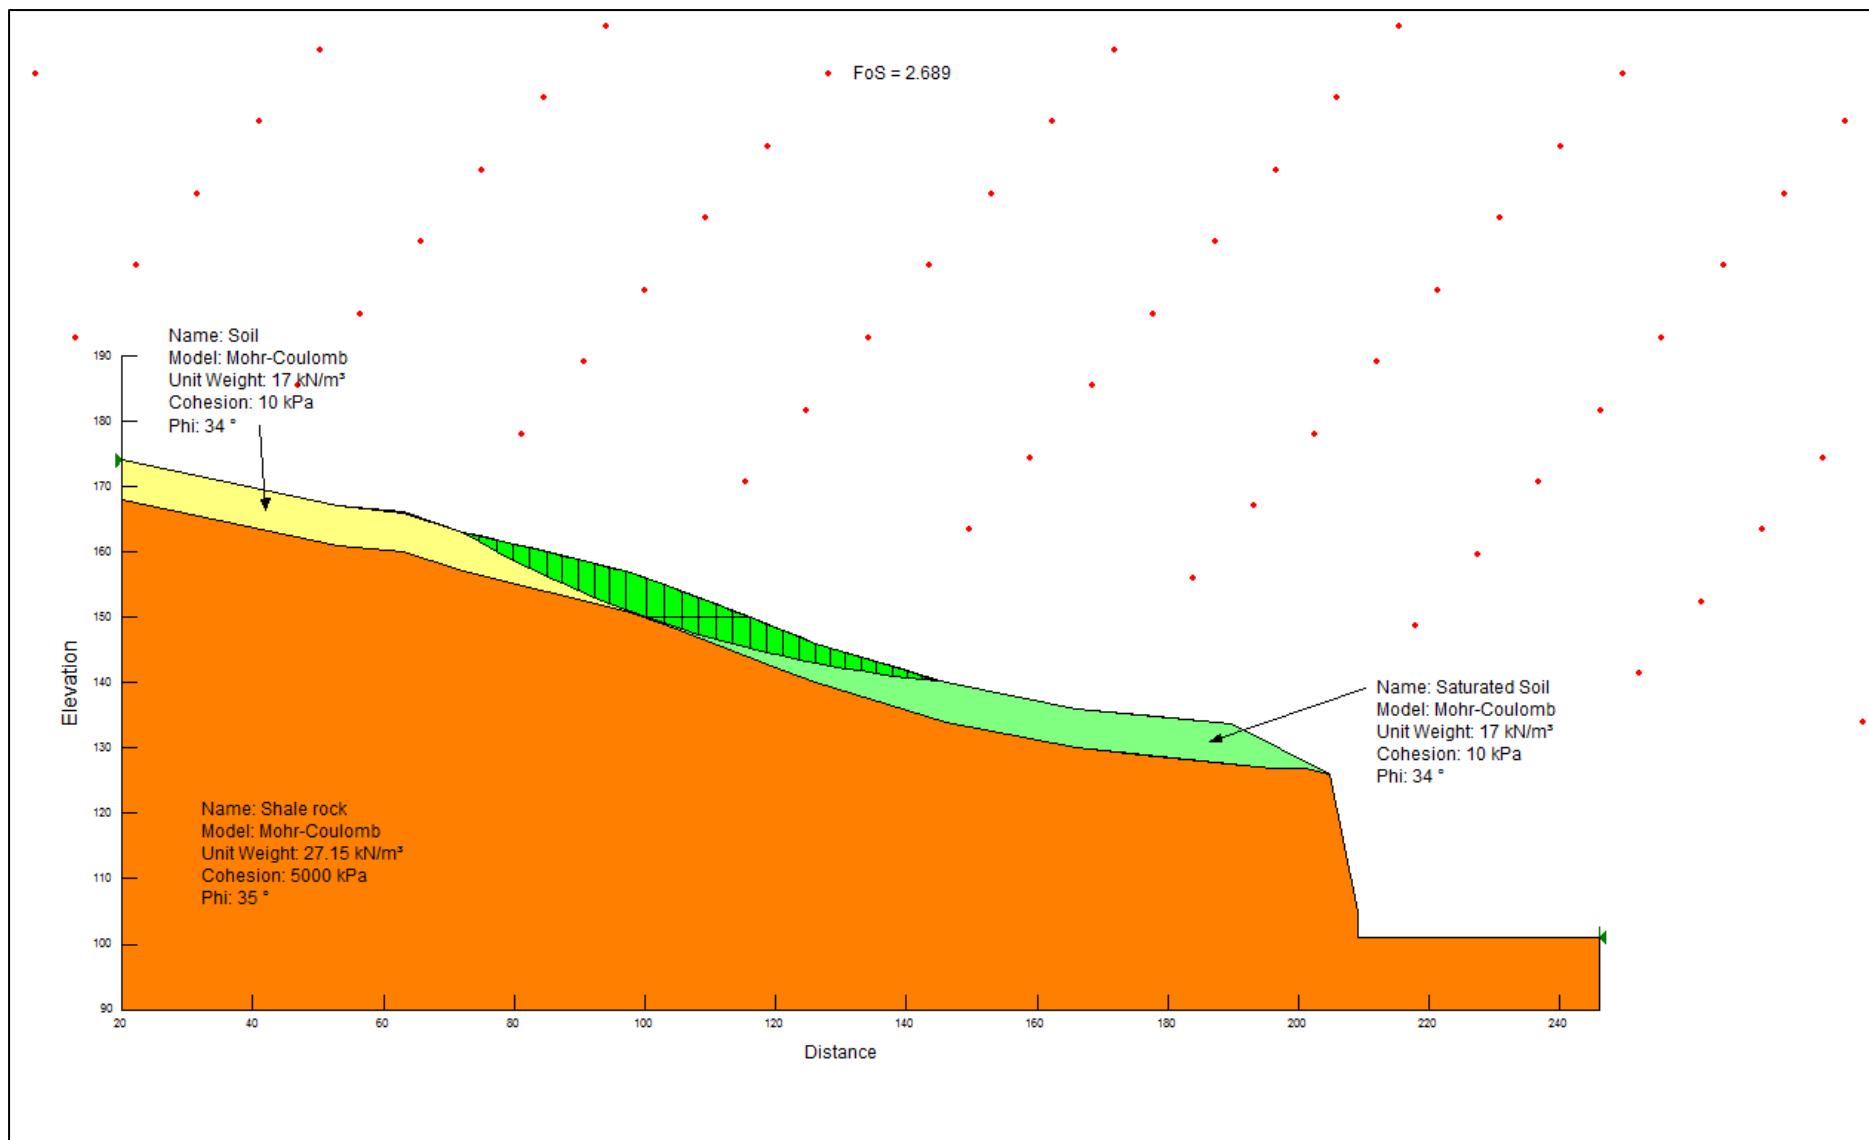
E.12: Inlet portal, Section 2, 1:0.2 excavation slope in shale, 1:2 excavation slope in soil
